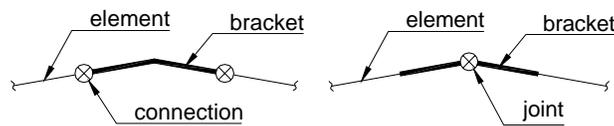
Two possible models for ridge joints: detailed (a) and simplified (b).
